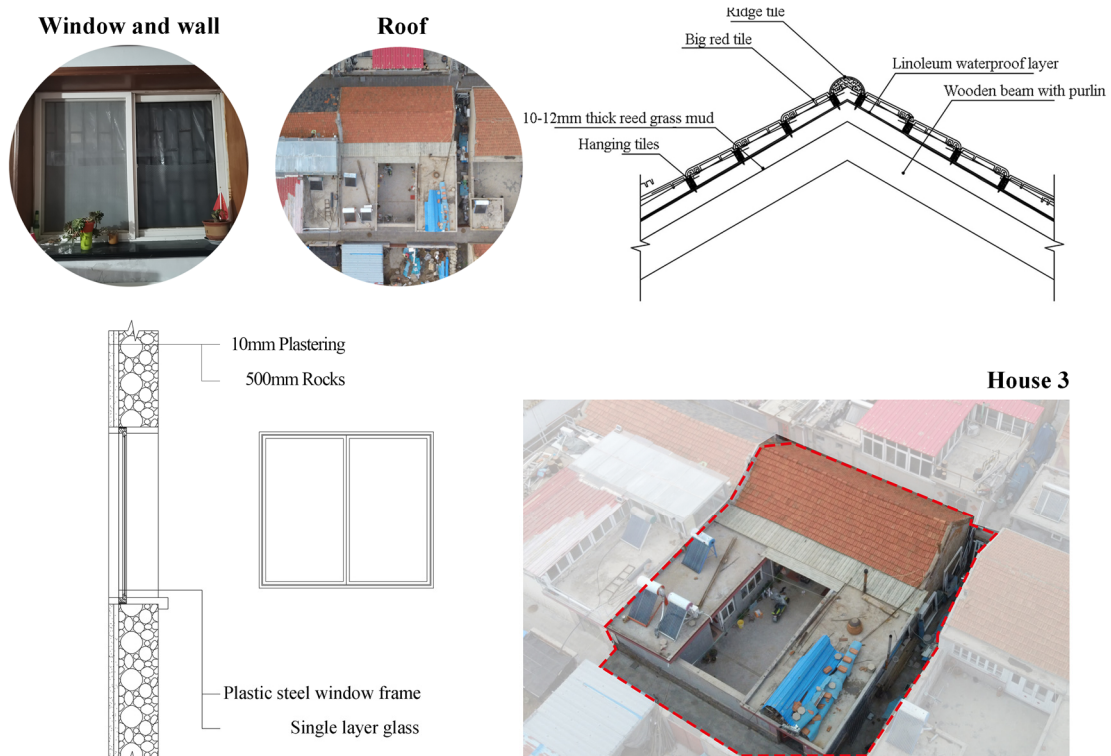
The roof, exterior wall, doors and windows of house 3
